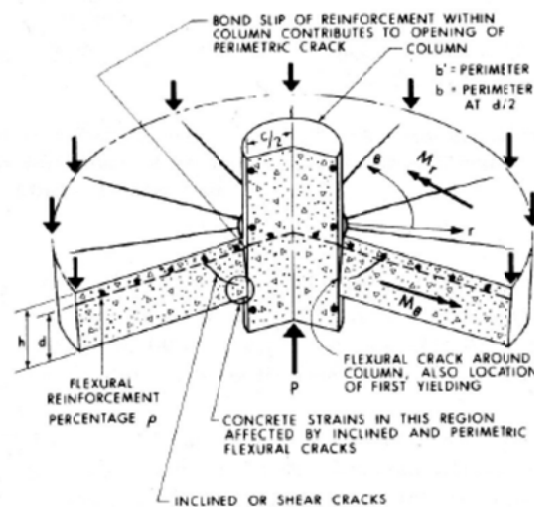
Crack formation in column area of slab (ASCE-ACI Committee 426, 1974).
